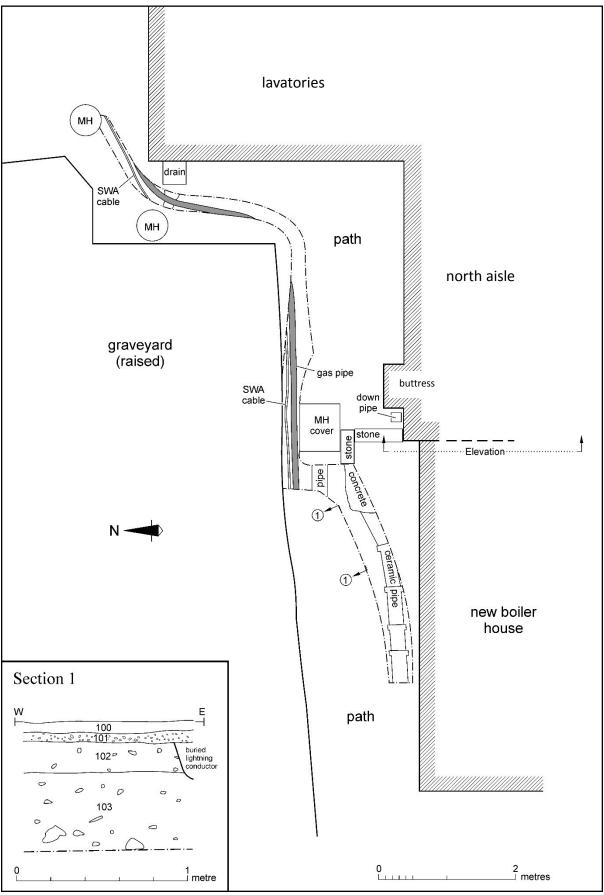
Plan and section of the excavations for service trenches on the north side of the church.
